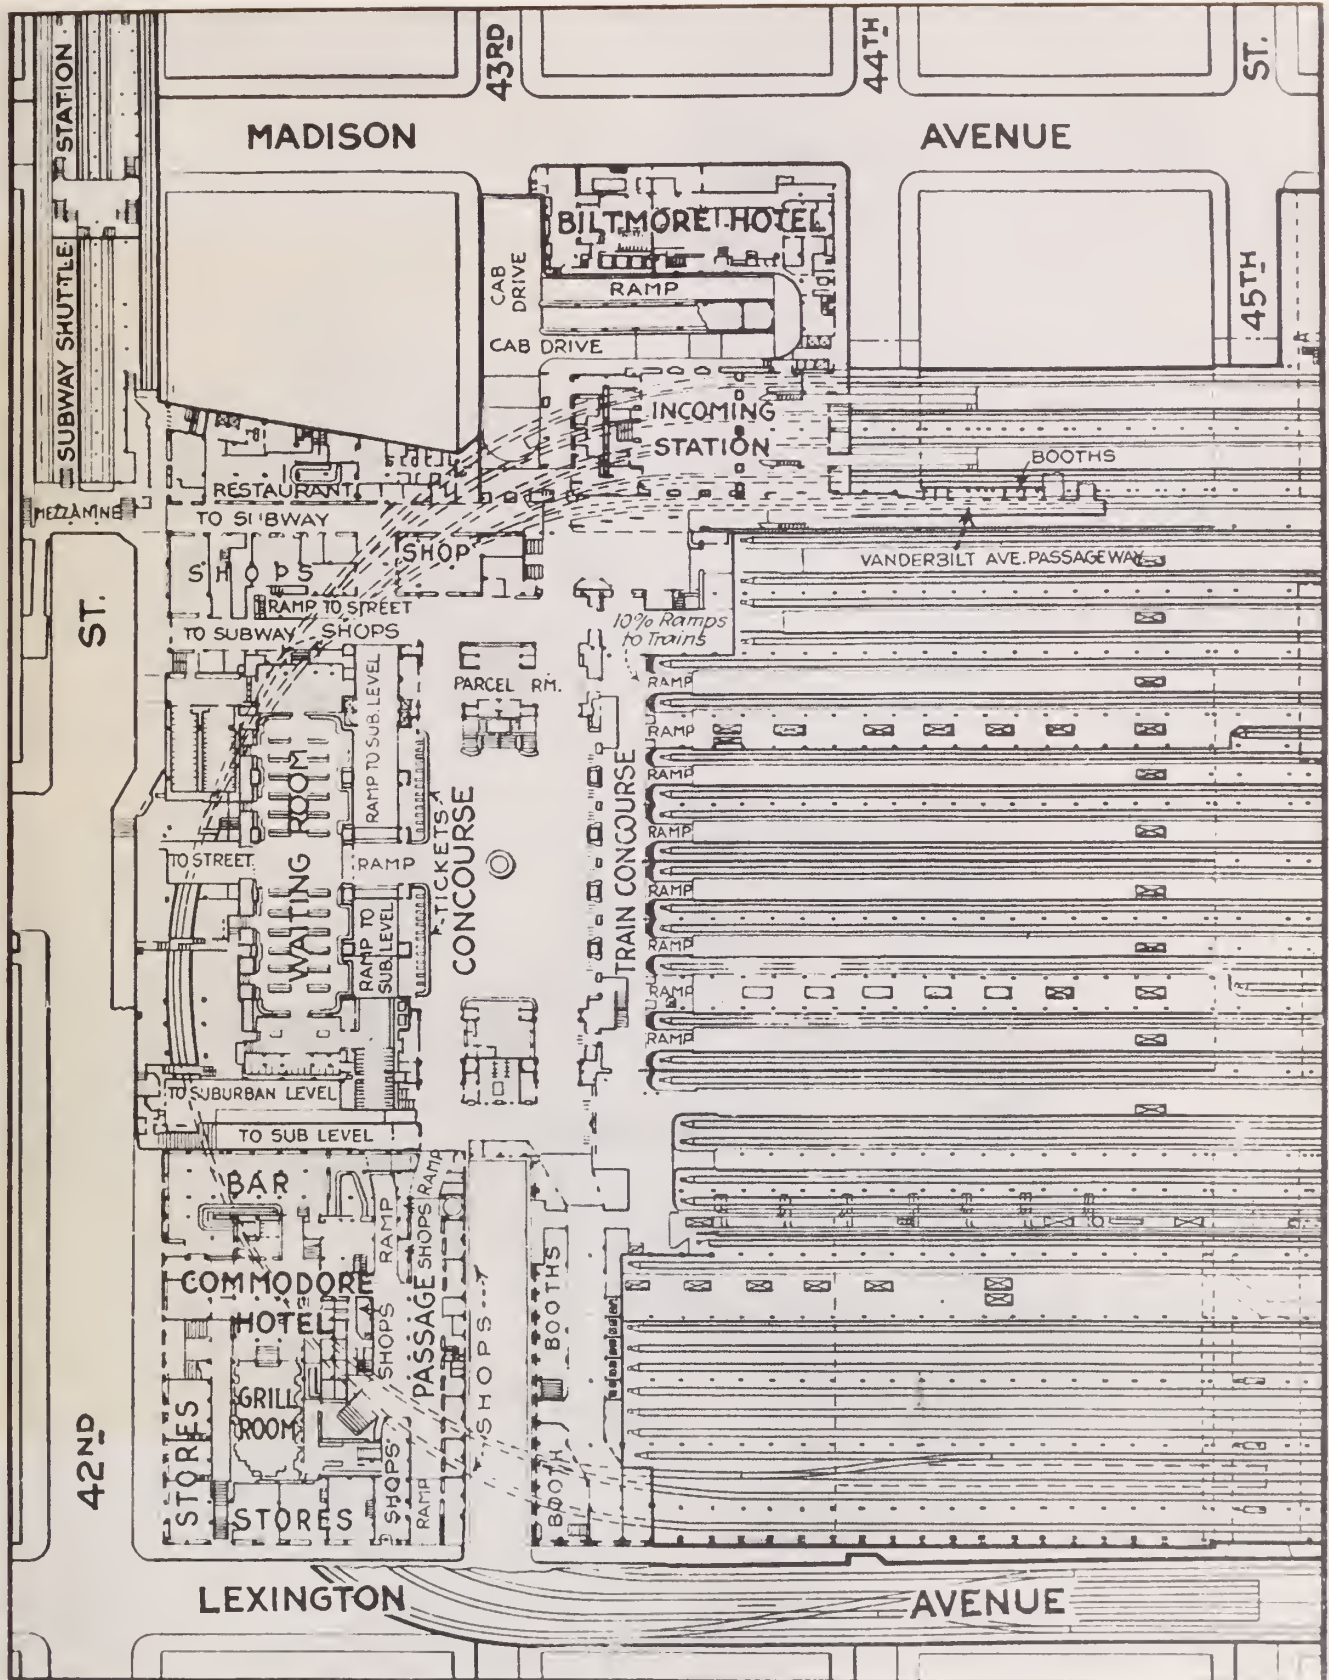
Long-distance train level and Concourse, Grand Central Terminal. A system of easy ramps made possible stair-free movement from train platforms into the Concourse and out onto sidewalks.
